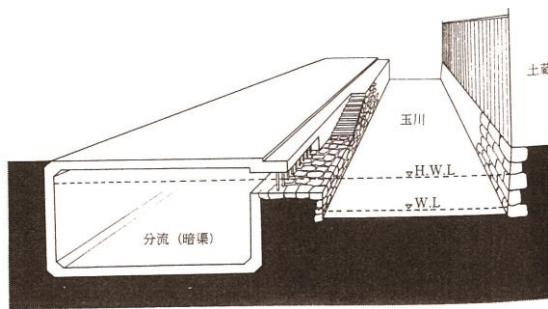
Plan of 1982, floorplan of the project. Source: Kurayoshi city.
